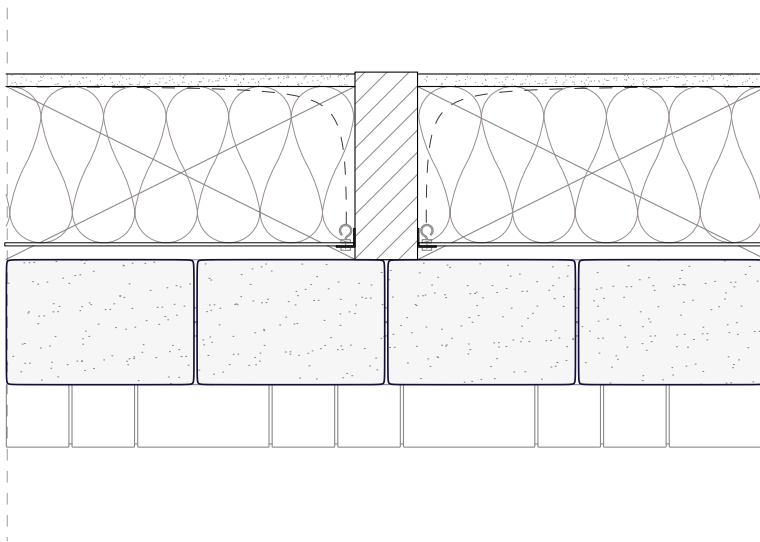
| Detail B. New wall: rammed demolition waste wall, with brick top layer, timber framework, rammed demolition waste blocks, metal mesh, reed insulation, loam finish
